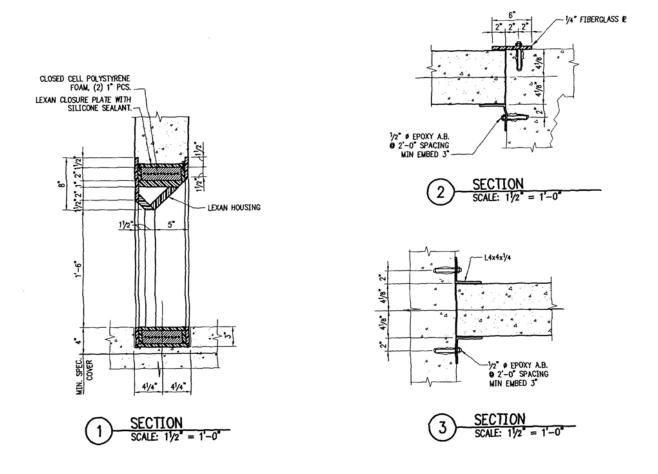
Orifice/ Weir Antenna Housing - Sections (Fiberglass Reinforced Concrete)
